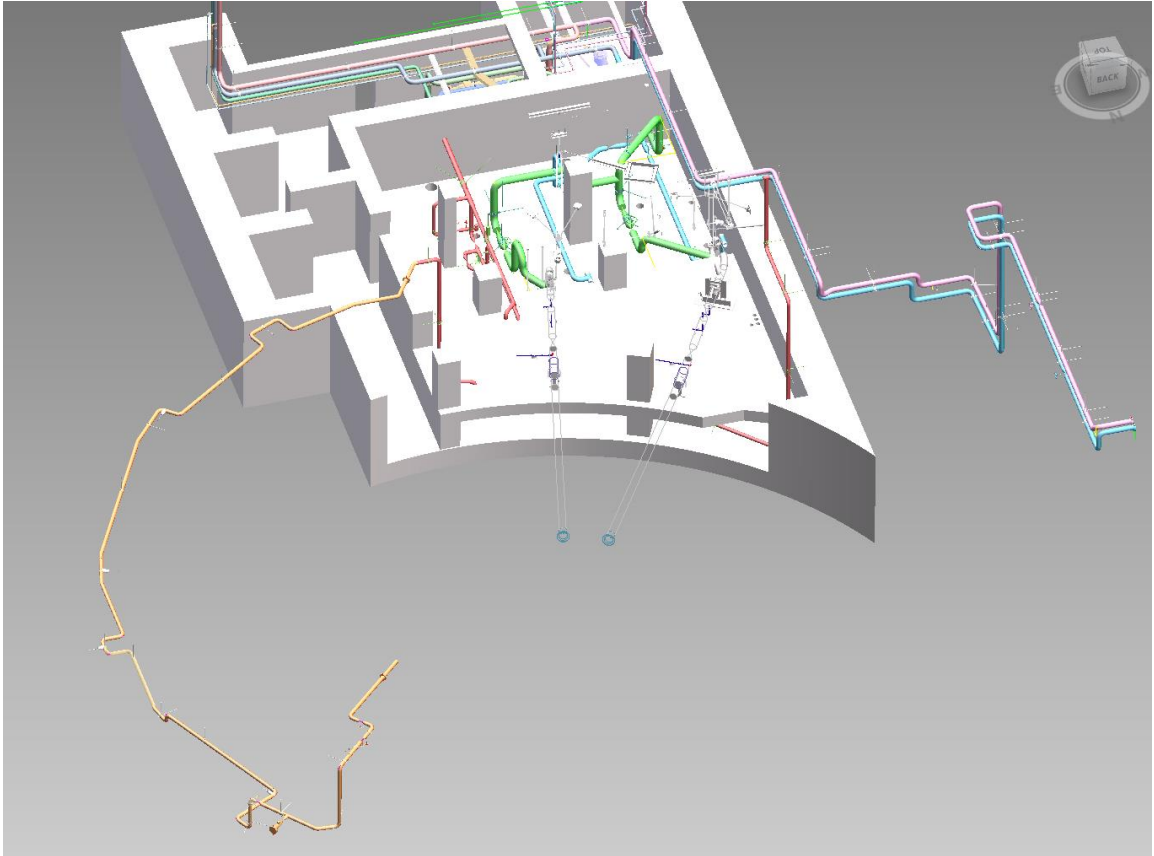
Ground plan of the AB el. 89, showing new piping and major equipment (PMP, HEX) – look from plant north side
